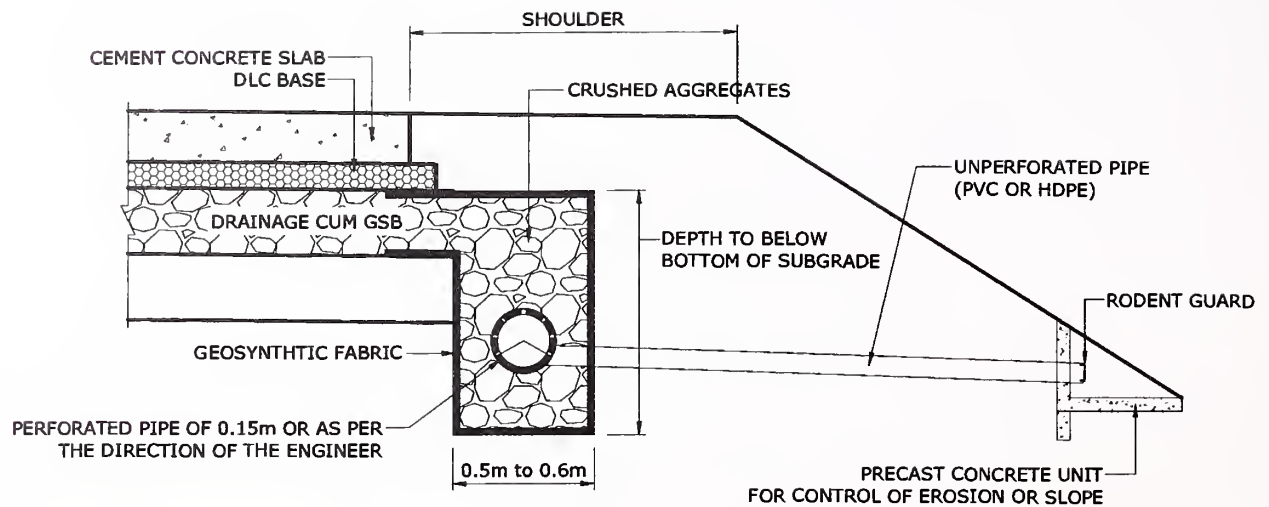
A Typical Cross-Section of Road Showing 'Drainage Layer' Terminated at Pavement Edge in a Rigid Pavement
